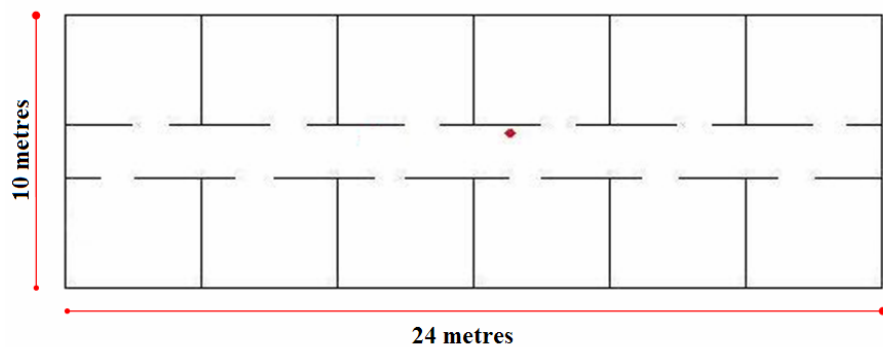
DIET Planimetry, floor one, source in the second position.
